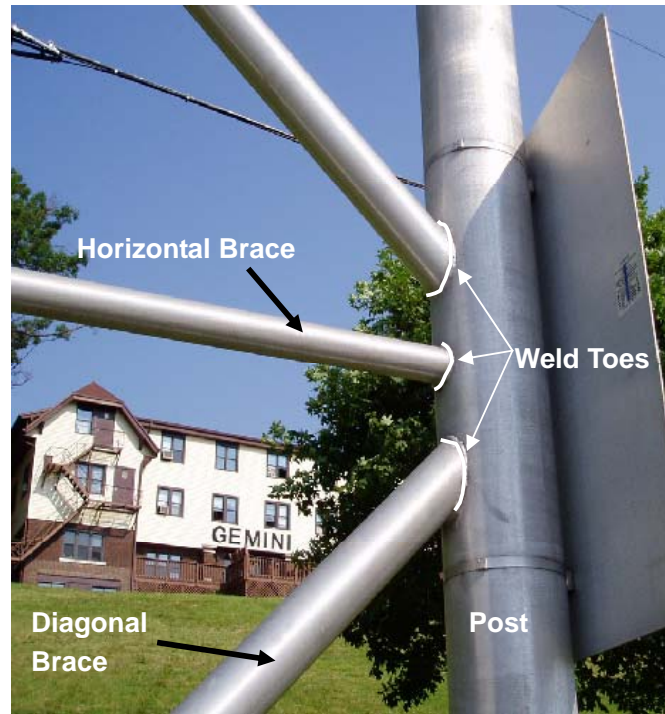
Lateral-braces-to-post connection for a box-truss sign structure.
